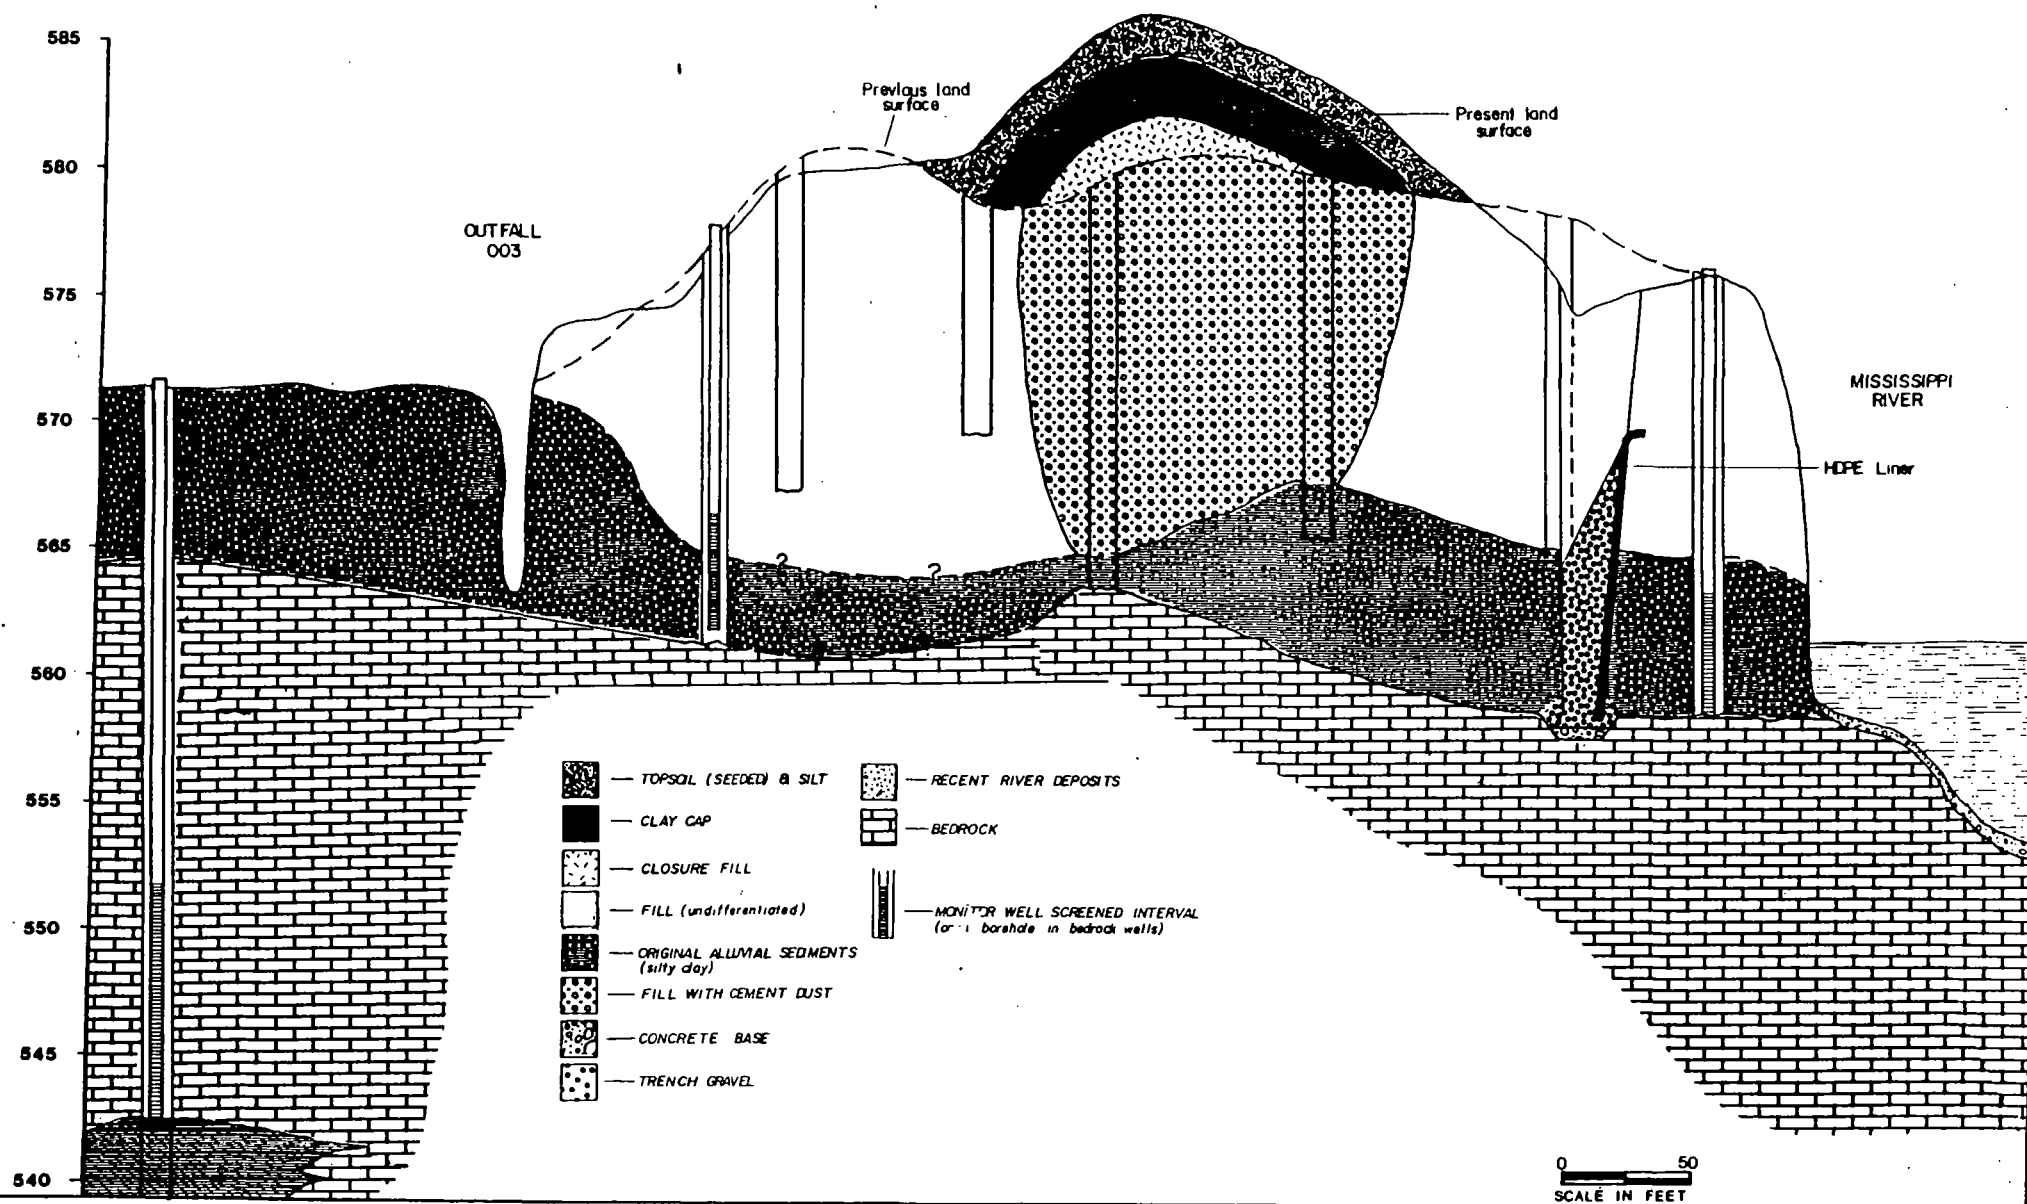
Northwest-Southeast Cross Section C-C' Through the Center of the Alcoa-Davenport Waste Site.
